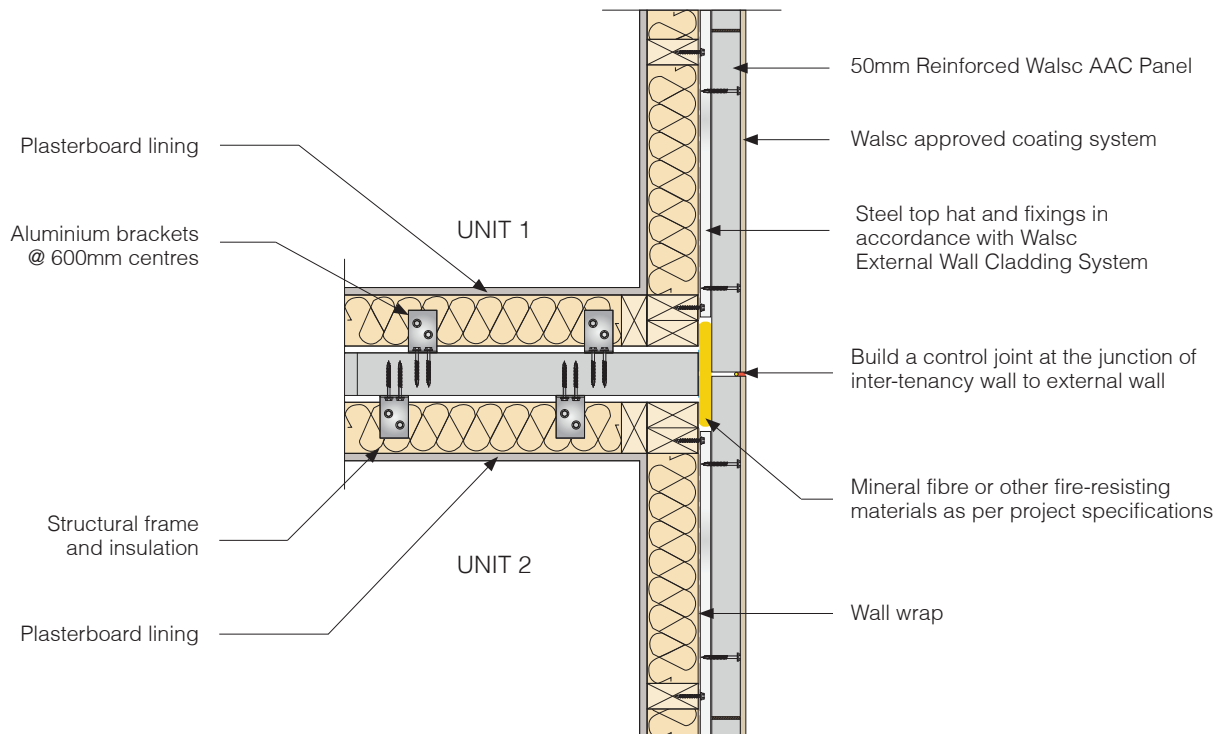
Vertically Aligned System External Wall Junction Detail 1
